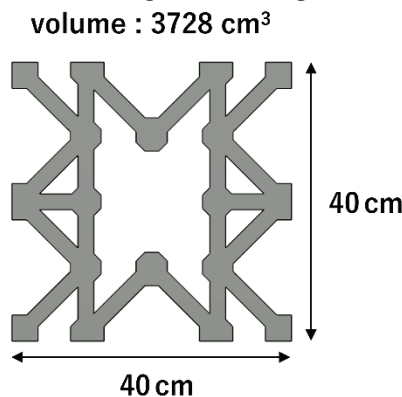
Investigated design for 3D-printed ACM specimen. Thickness is 8 cm.
